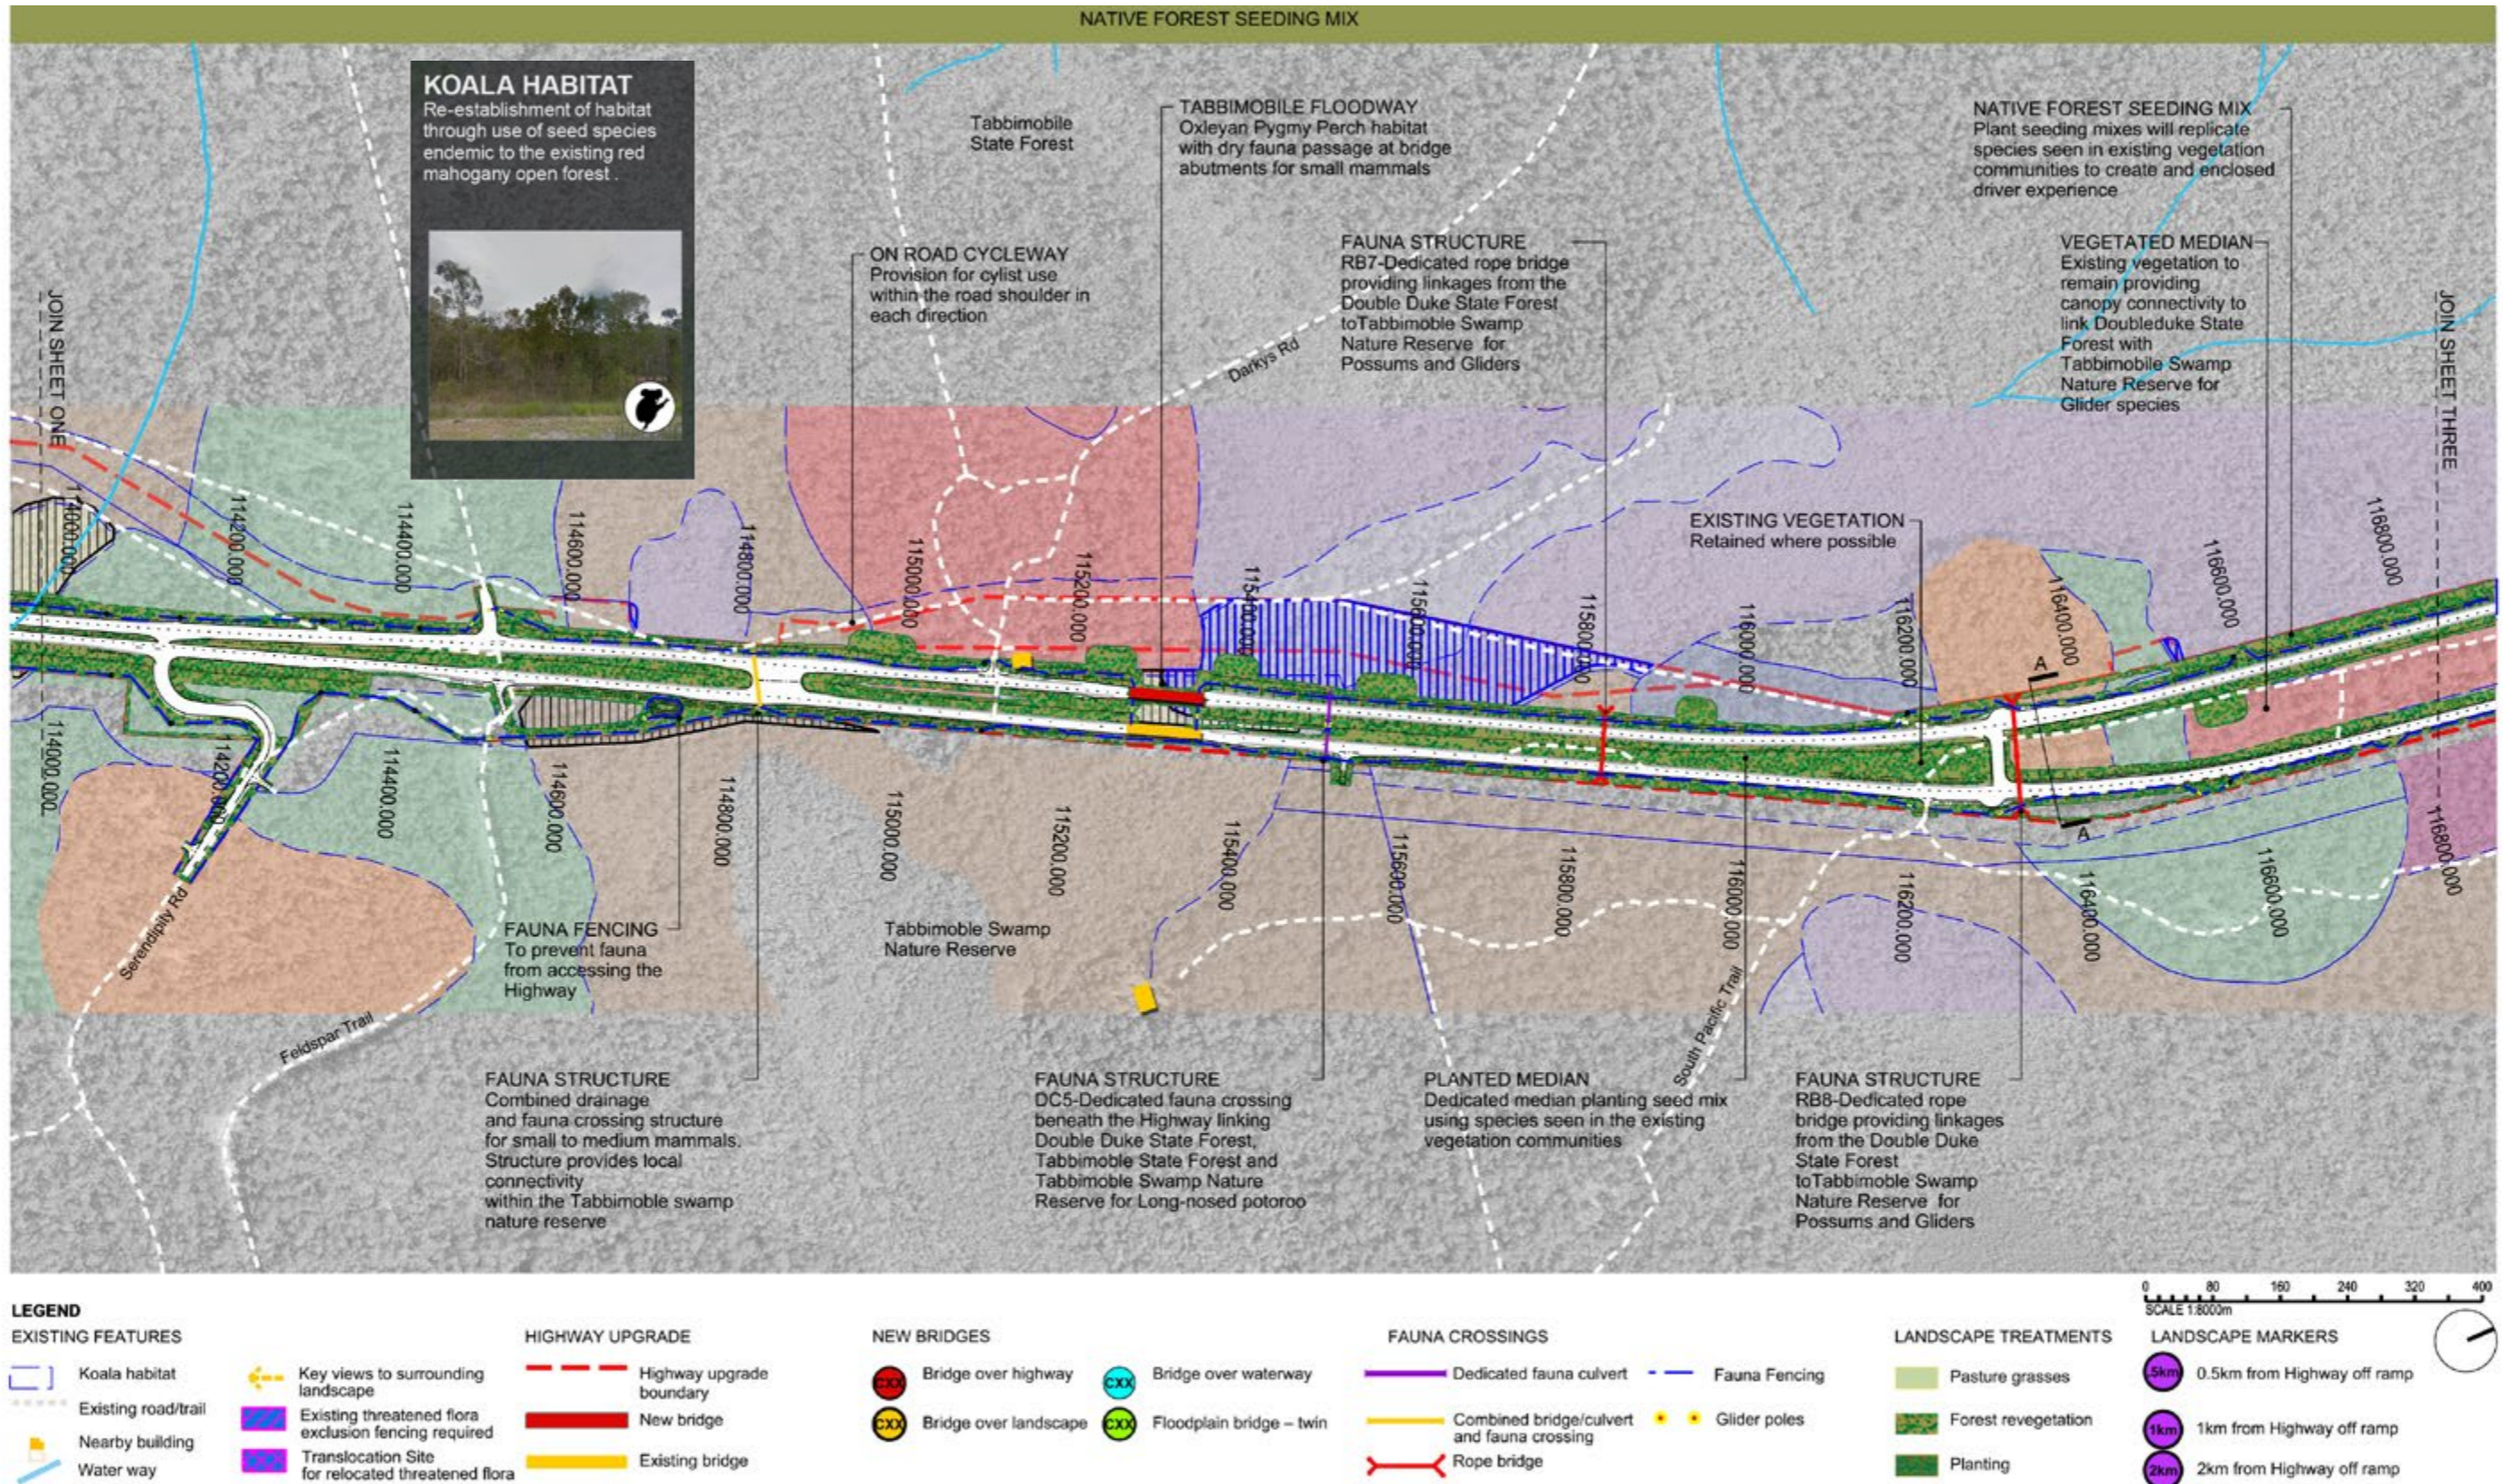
Urban and Landscape Design Strategy Plan – Devils Pulpit to Trustums Hill – Sheet 2
